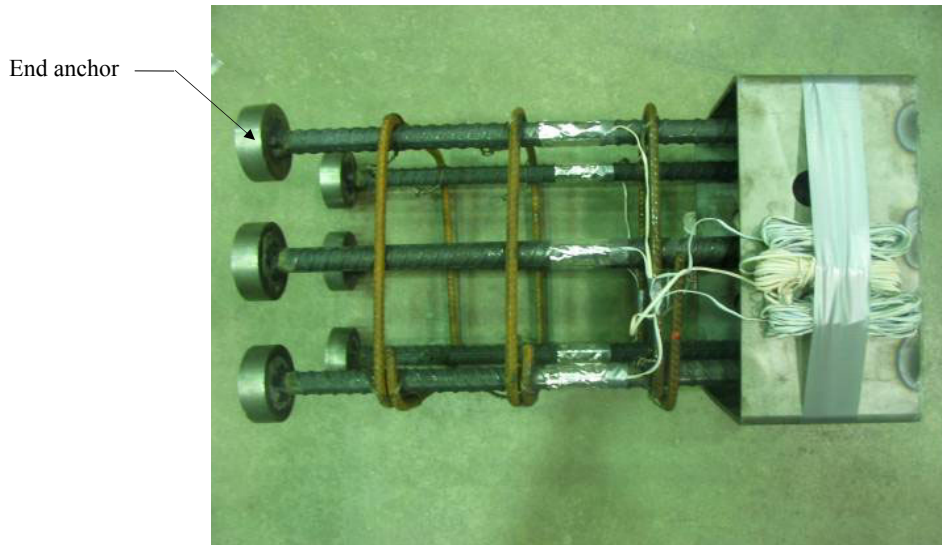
Photograph of Column 5, 2 ft. segment reinforcement.
